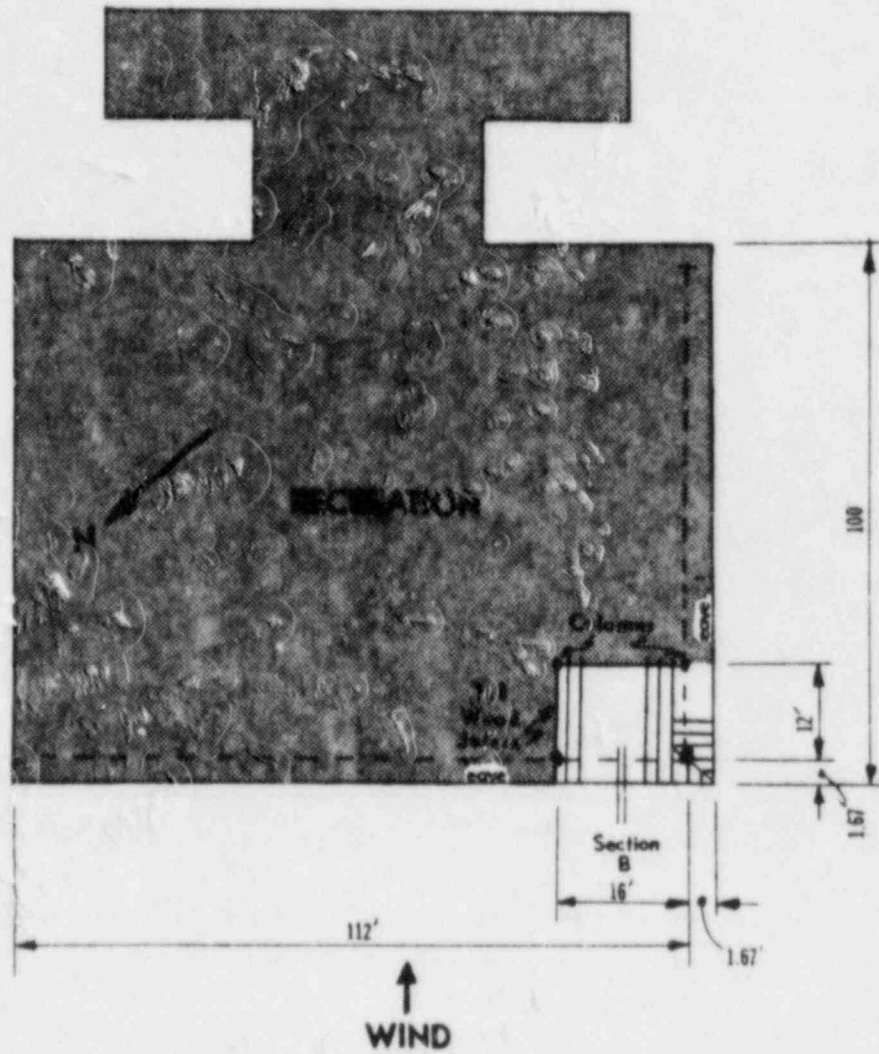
ROOF PLAN OF RECREATION BUILDING (damage at roof corner is unshaded).
